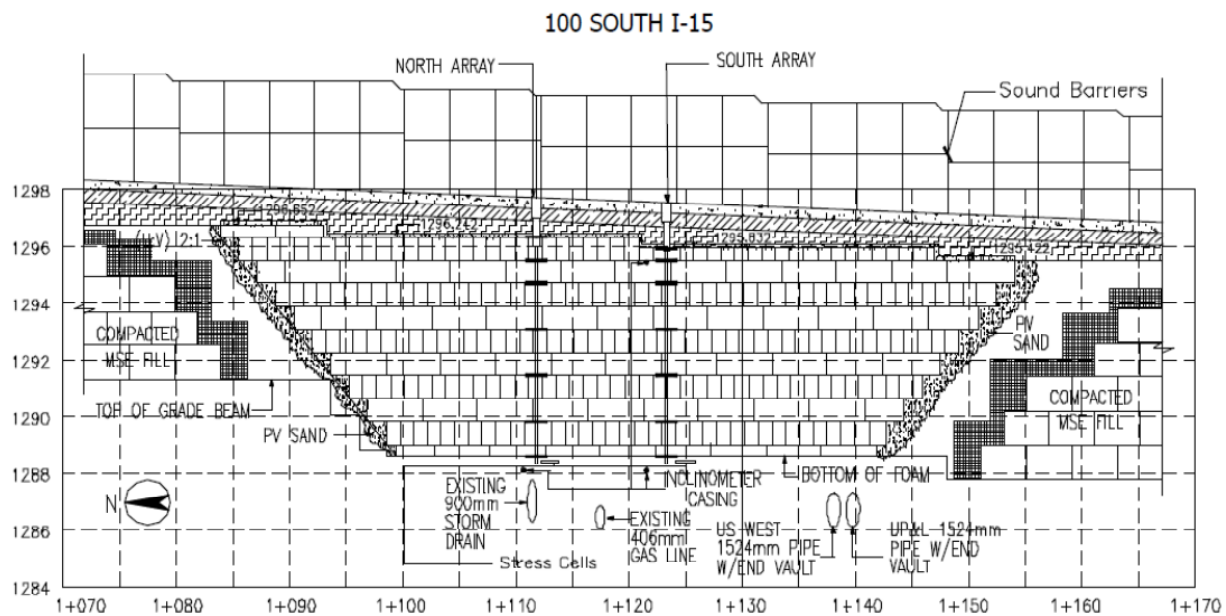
Profile View of the EPS Embankment and Instrumentation at 100 South Street, Salt Lake City, Utah, I-15 Reconstruction Project (Negussey and Stuedlein, 2003).
